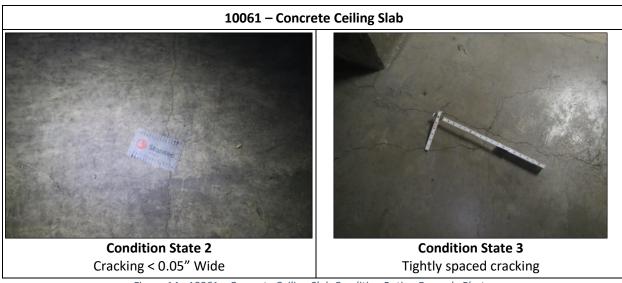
10061 – Concrete Ceiling Slab Condition Rating Example Photos
